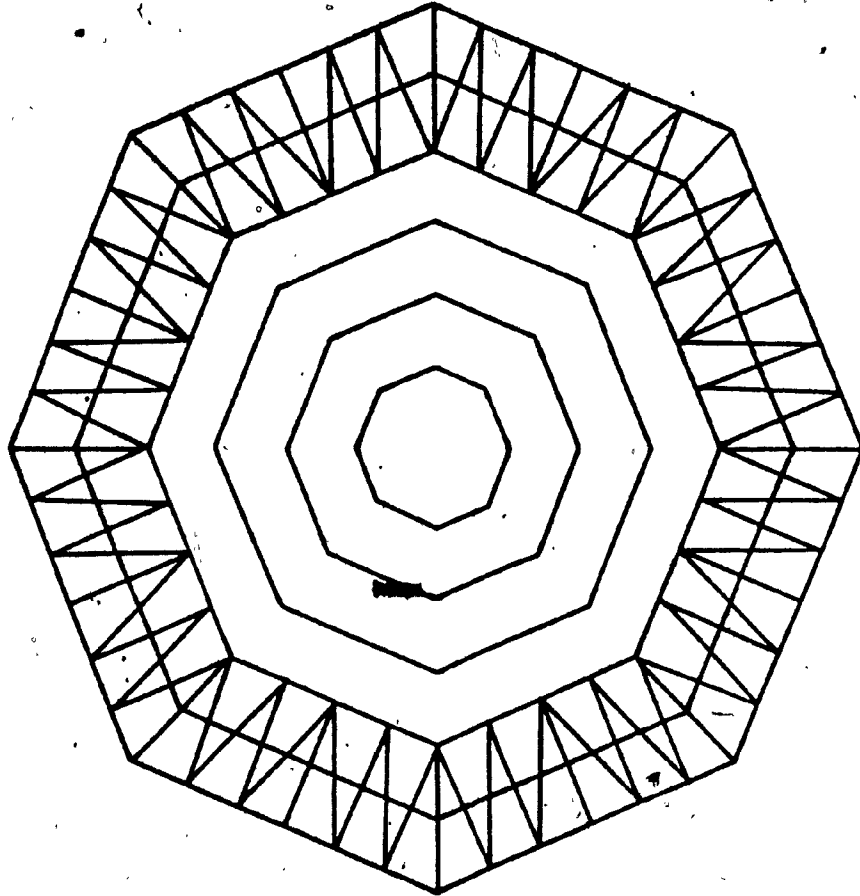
SECTION THROUGH A TYPICAL RING TRUSS.
